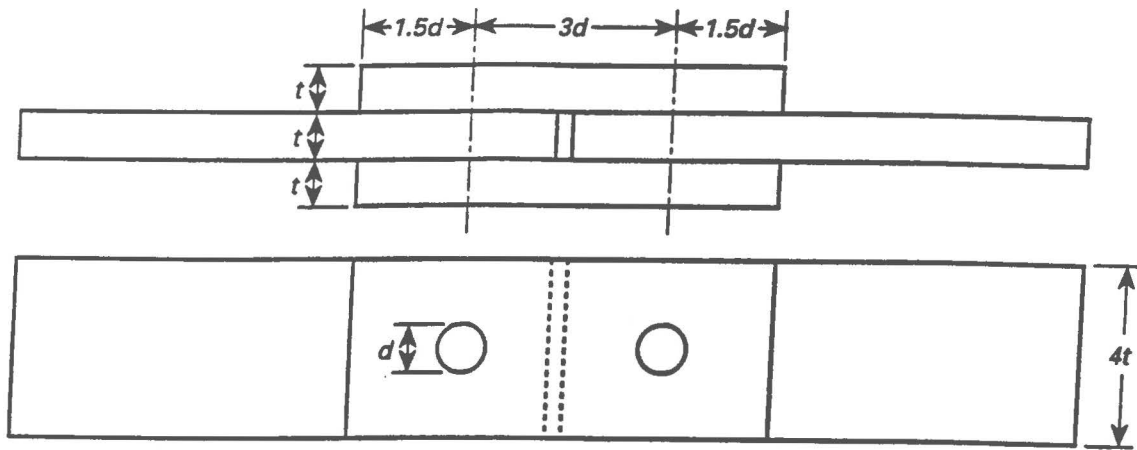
Joint detail tested with friction grip bolted joints (S-N tests)
